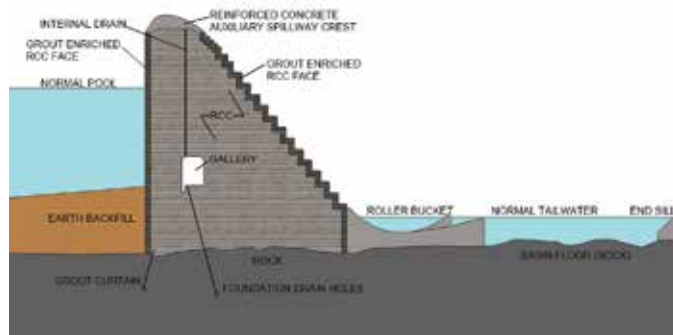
Grout-enriched section at Deep Creek Dam (© illustration courtesy of Schnabel Engineering)
